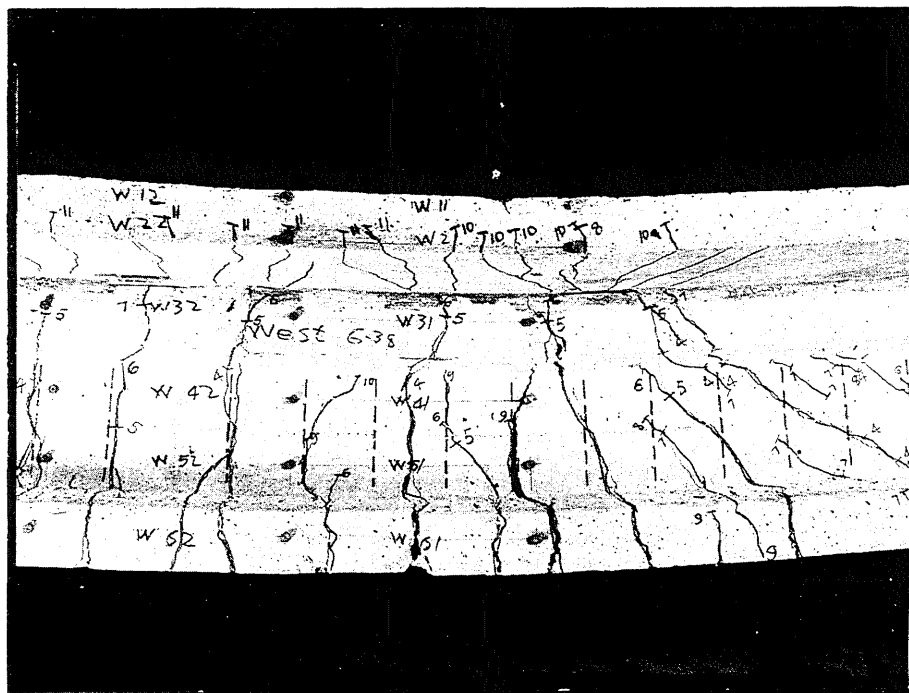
WELL-DEVELOPED FLEXURAL CRACKS, BEAM G38
